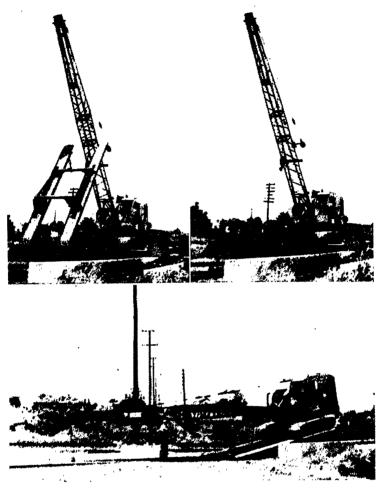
Upper Right, Crane and Ramp on Car; Upper Left, Ramp Being Unloaded; Below, Crane Moves Down Ramp.
